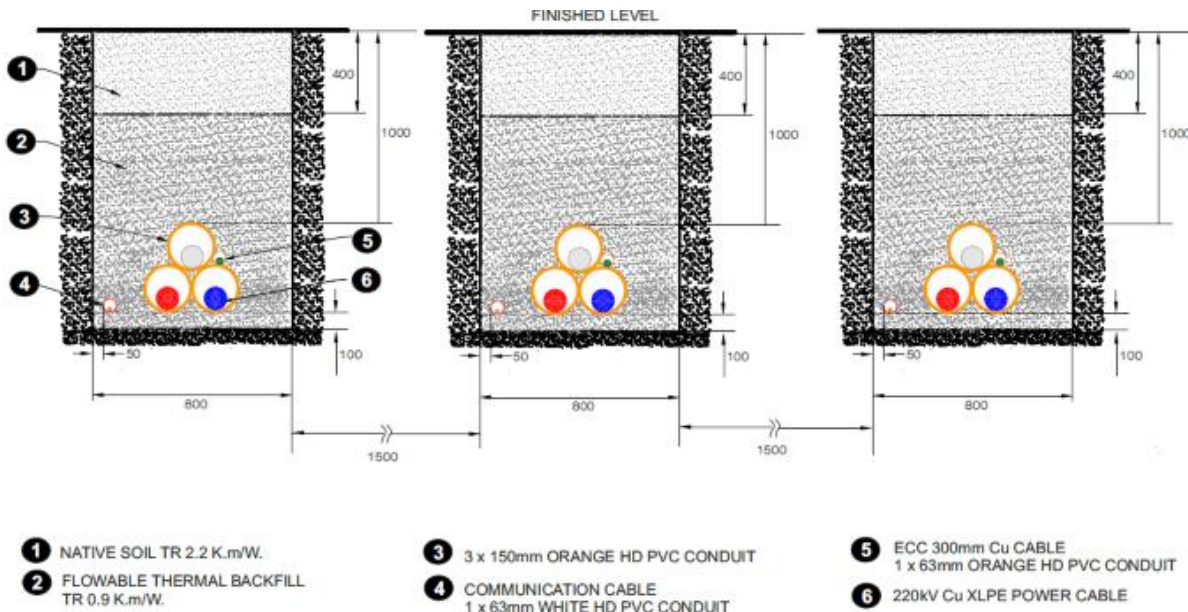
Customer connection preliminary cross section of the 220 kV underground trench (AusNet 2025)
